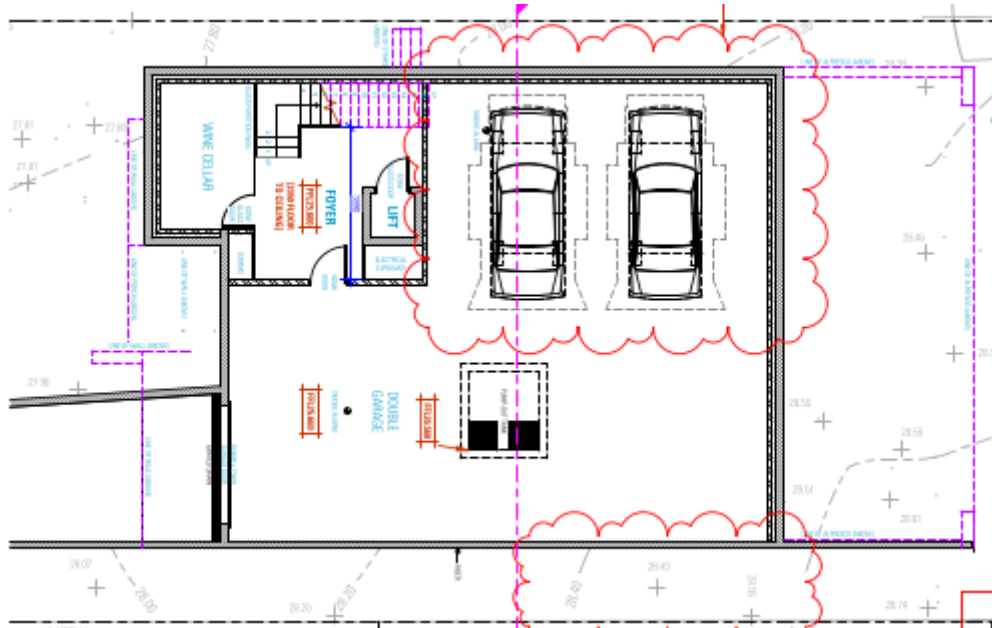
Extract of the amended basement plan, dated 08/12/2021.
